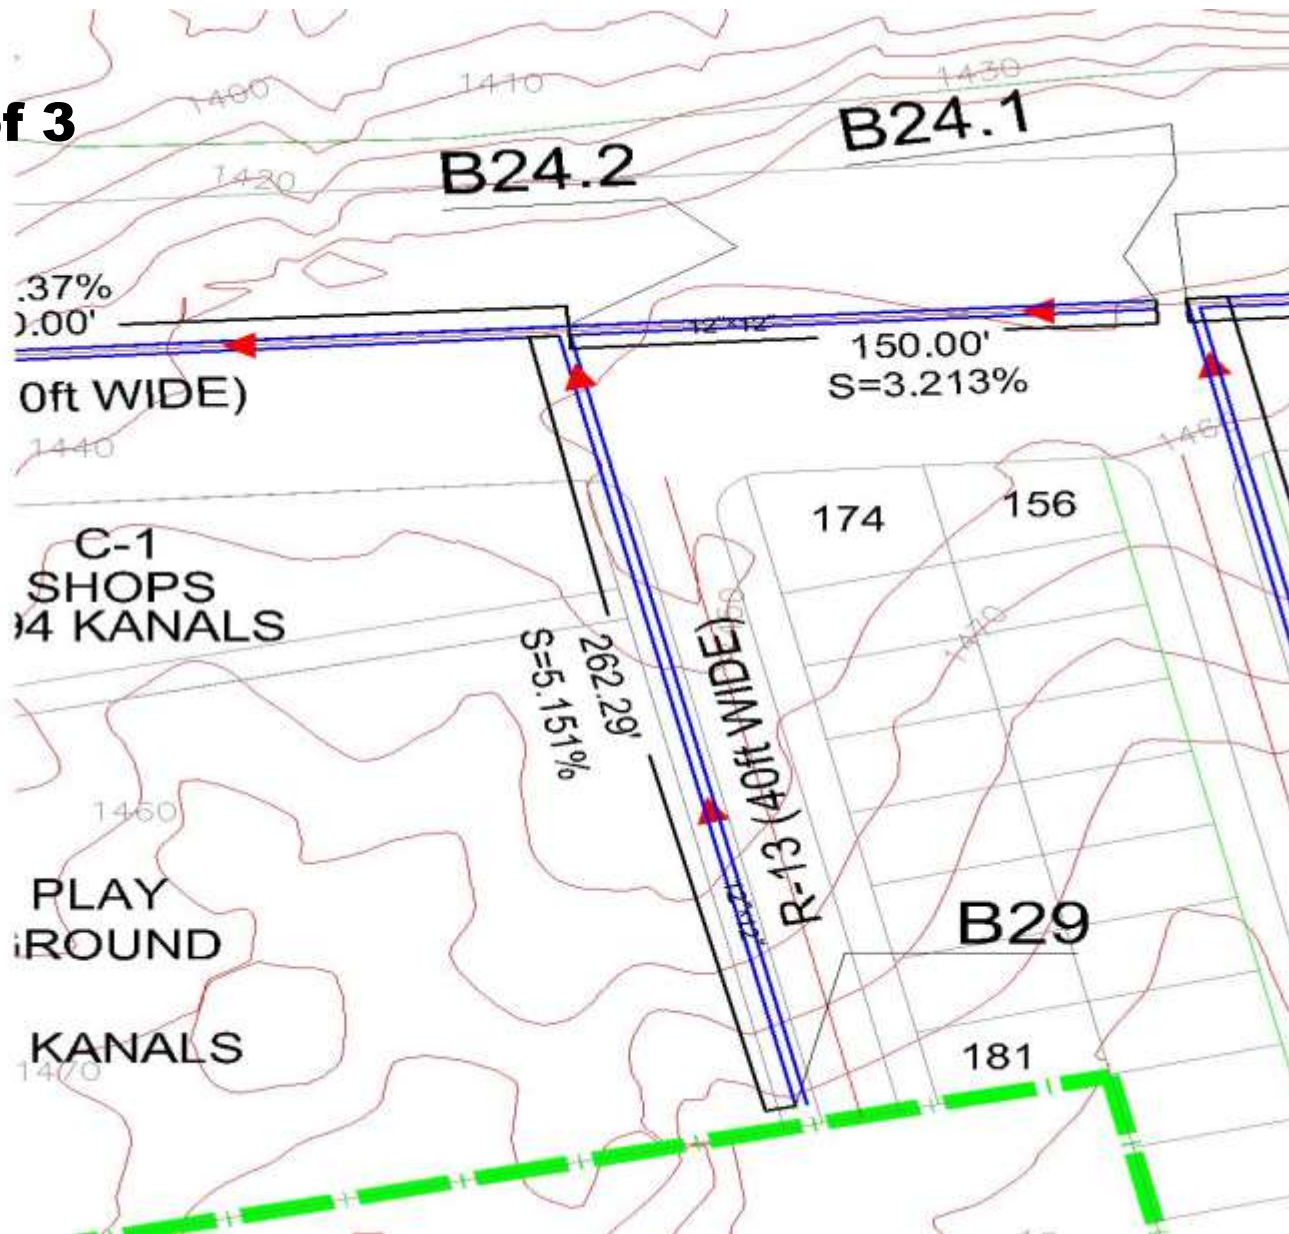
Storm drainage layout plan of Sub-catchment-3 showing initial nodes B29 & B24.2
